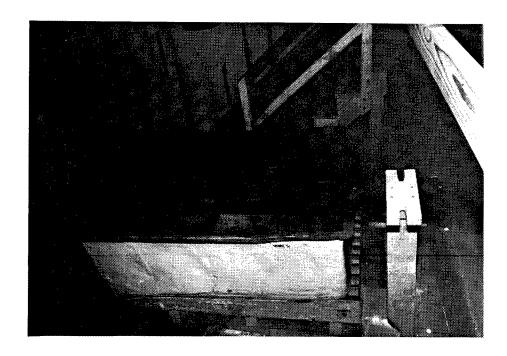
Building 6667-2: Catch tank with sloping bottom and baffles manufactured in 1942.
